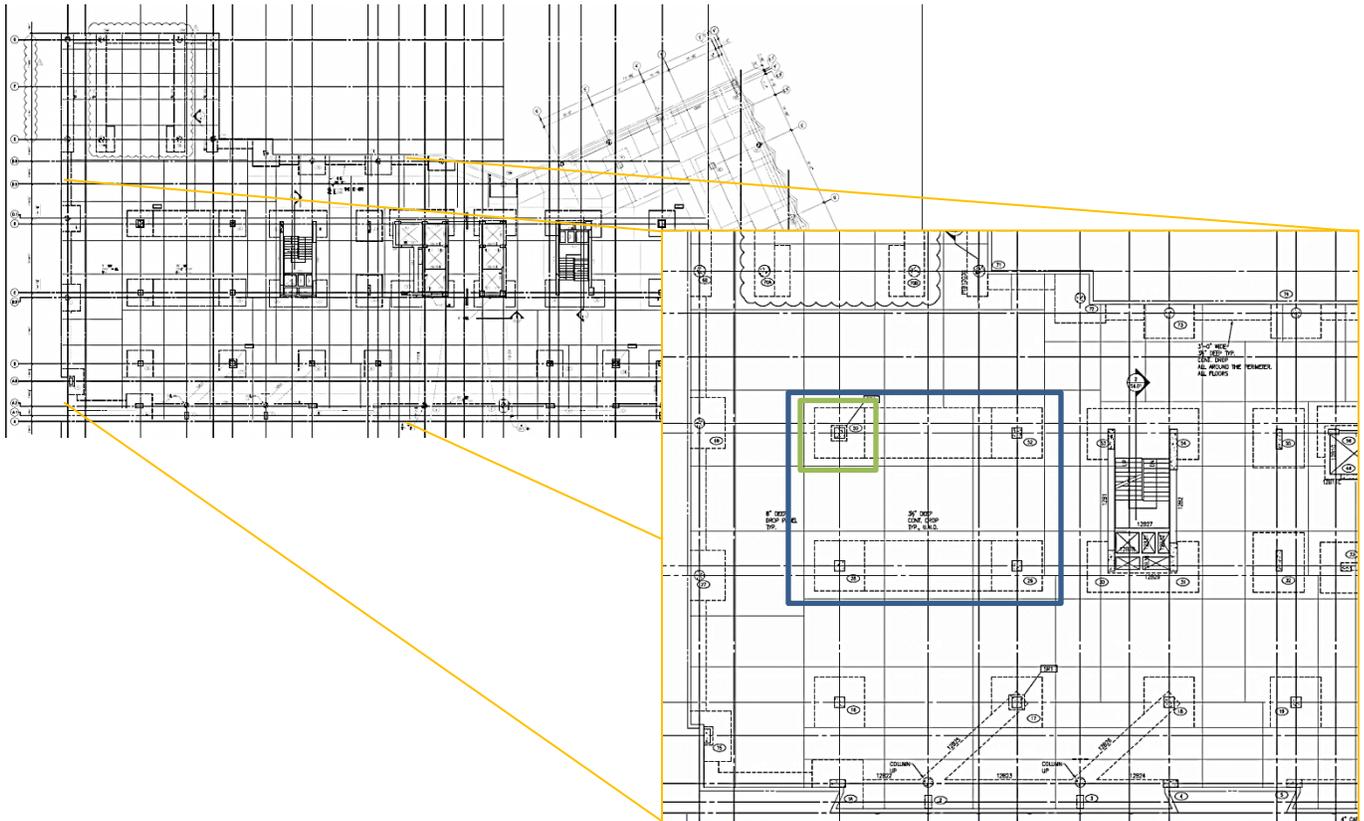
Existing system typical structural layout (left) and an enlarged layout of the interior panel used for gravity spot check analyses (right)
